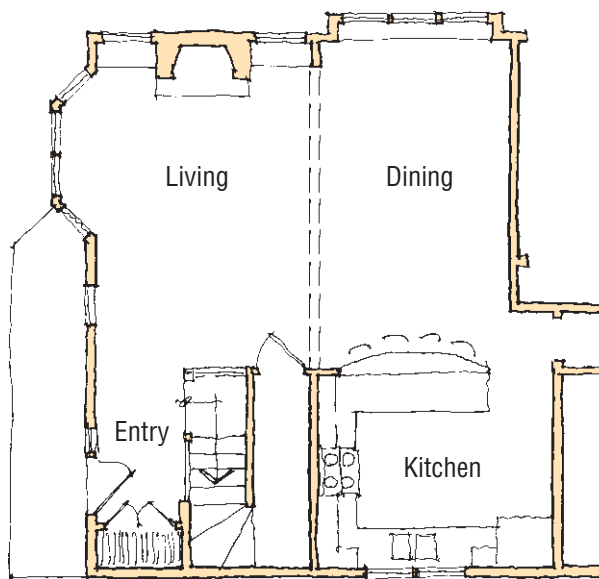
A successful open plan is more than a single undefined space. Soffits, built-ins, floor treatments, and trim can all be used to give adjoining areas their own identities while keeping a spacious, open feeling.
